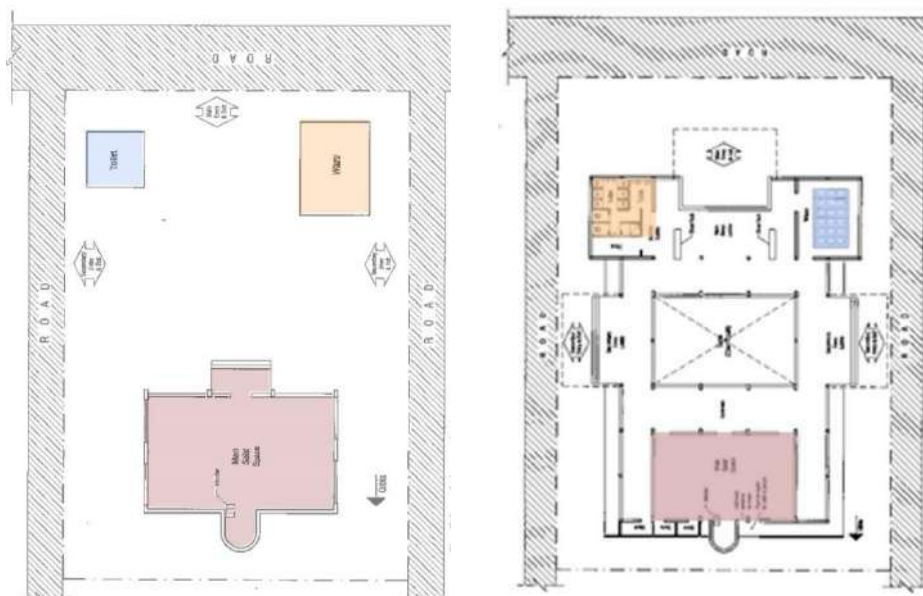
schematic diagram scheme a & b showing the floor plan of traditional type .
